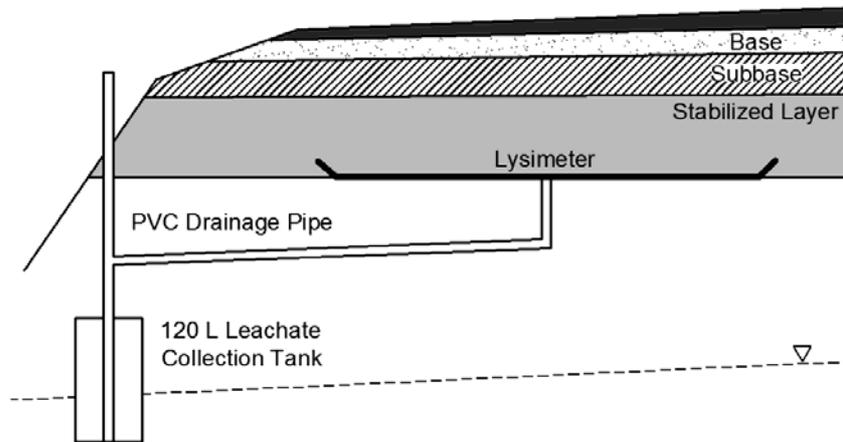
Typical lysimeter detail based on designs reported in O'Donnell²⁶ and Wen et al.³¹.
